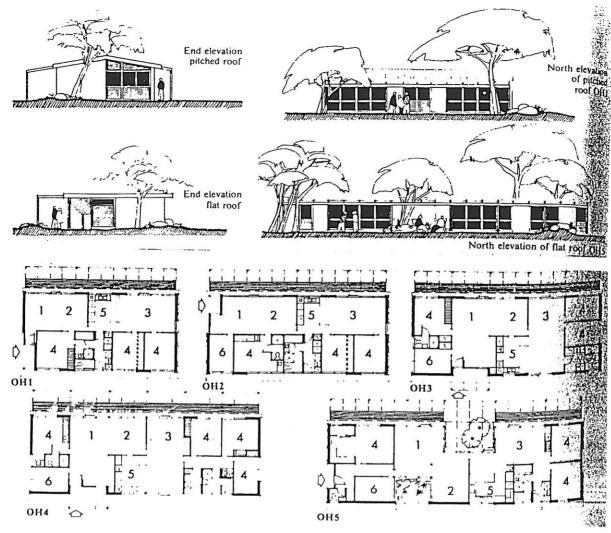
Elevations and plans of the Open House at Vermont Park, 1977 Source: Architecture Australia, October/November 1978.
